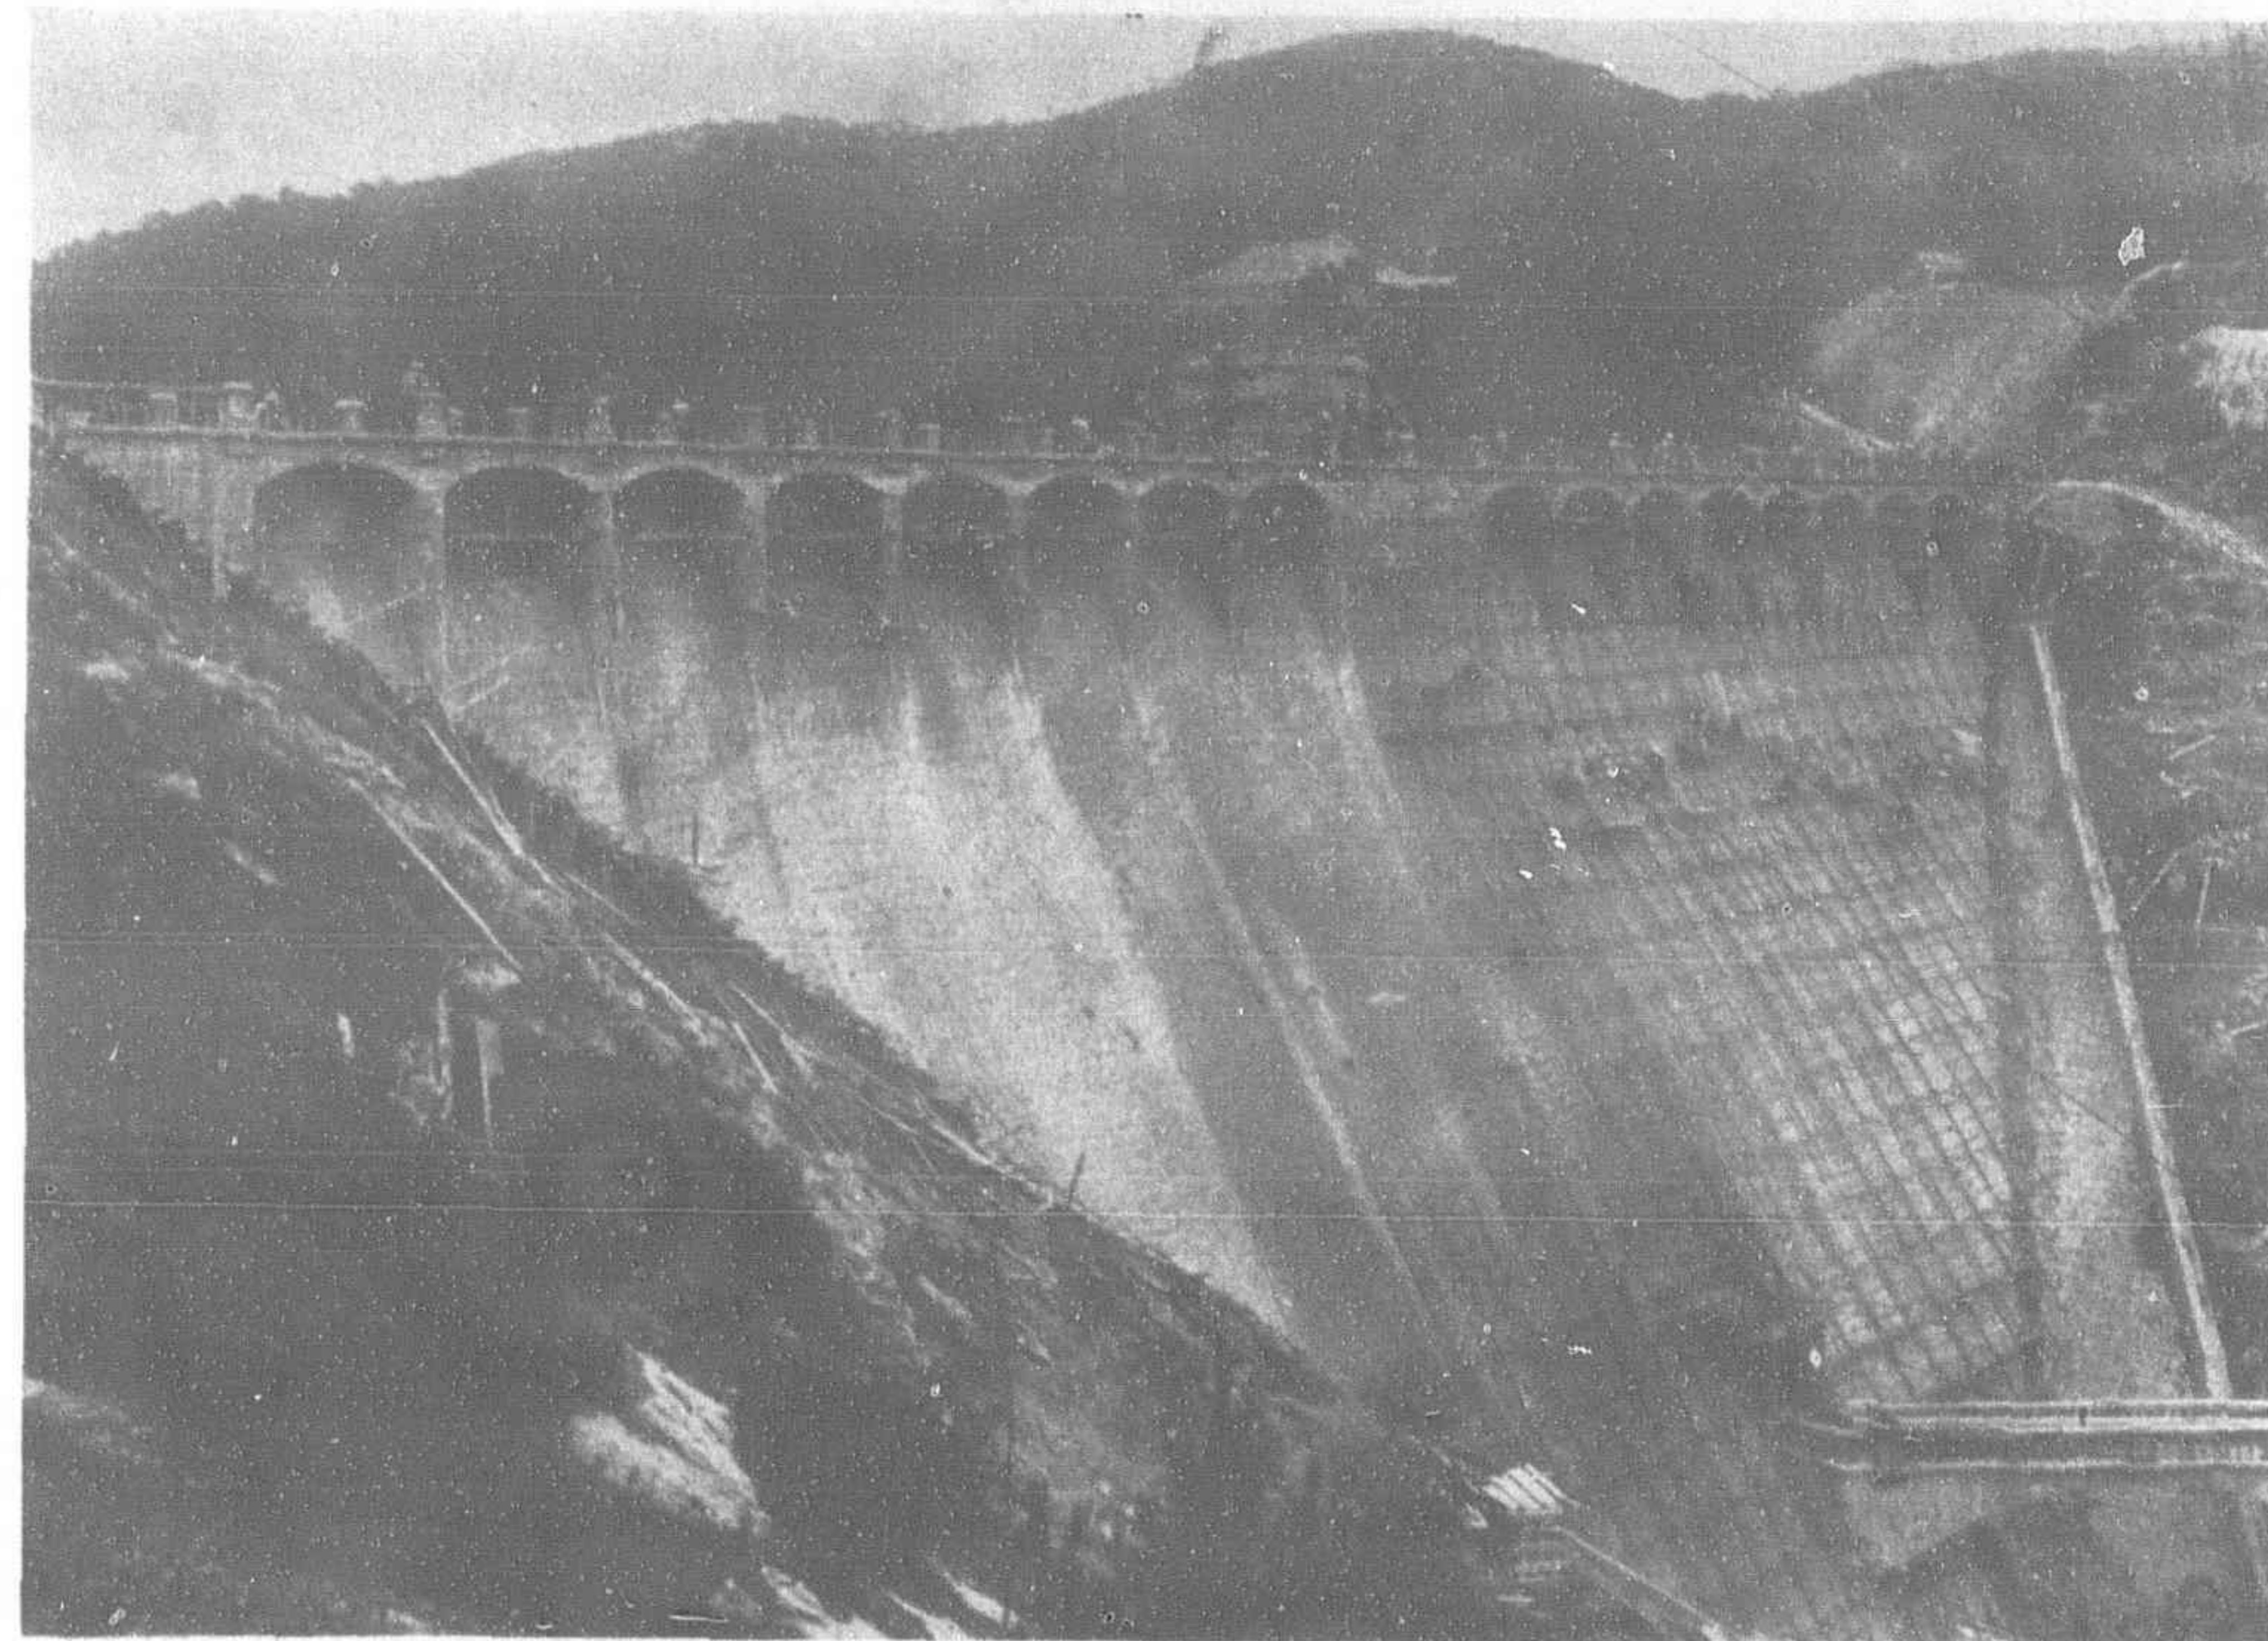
Cleaning downstream Face of the Kowloon Byewash Dam
